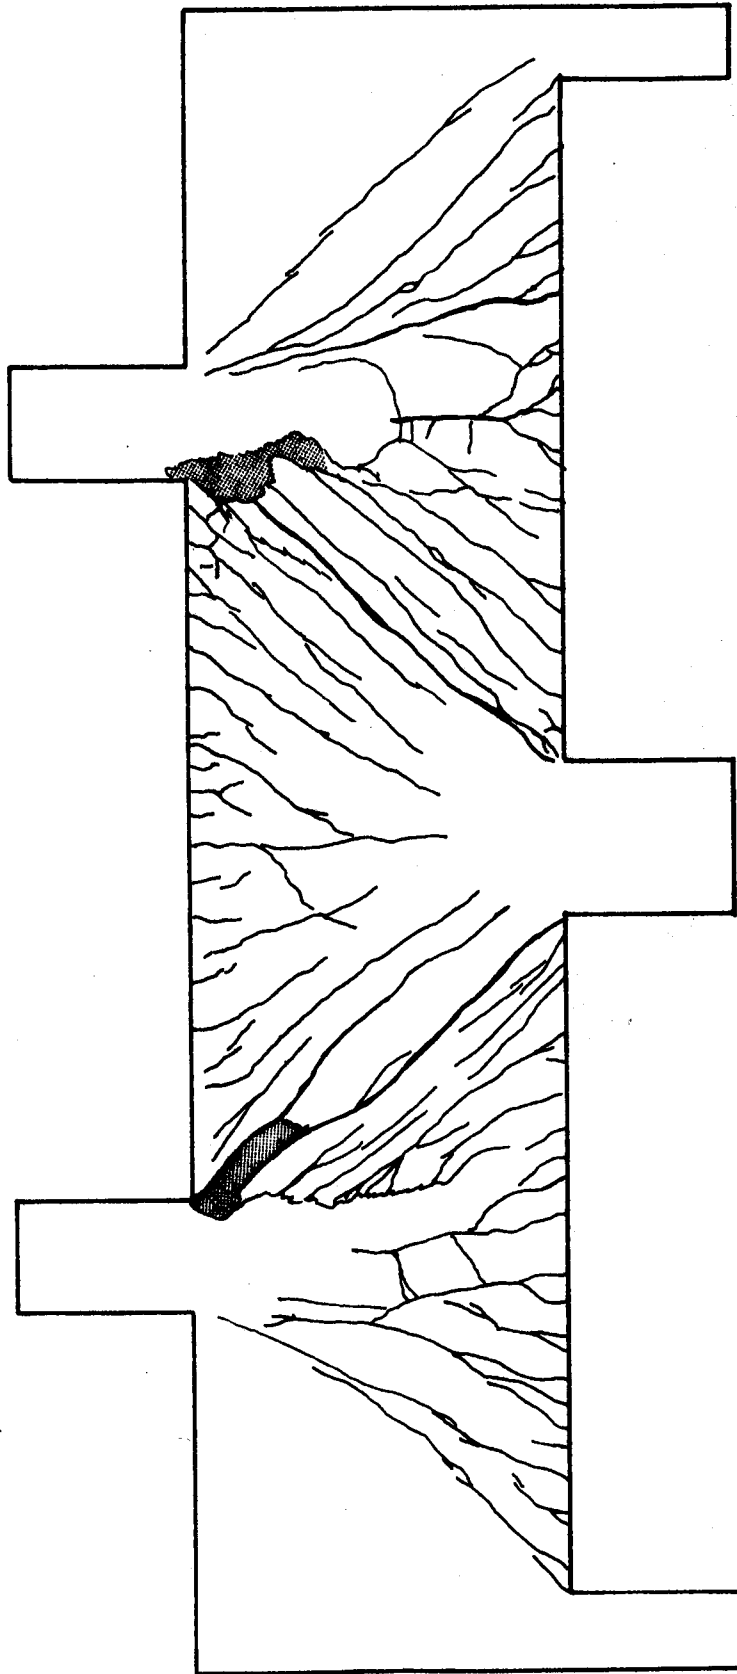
Beam 5/1.0 Crack Pattern - East Face (Reversed)
